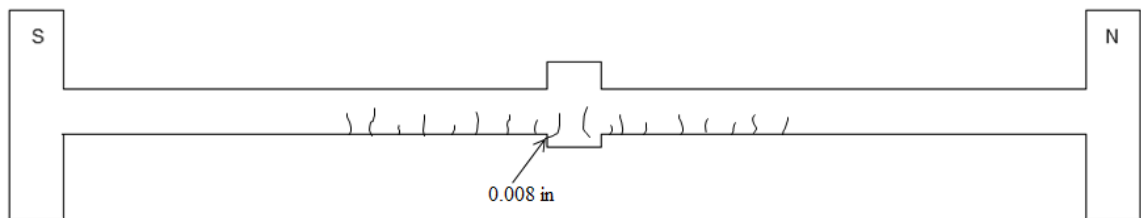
Crack pattern of Specimen 2 formed by the self-weight of the specimen during handling and positioning, and by weight of loading beam (Crack widths not indicated are smaller than 0.008 in.)
